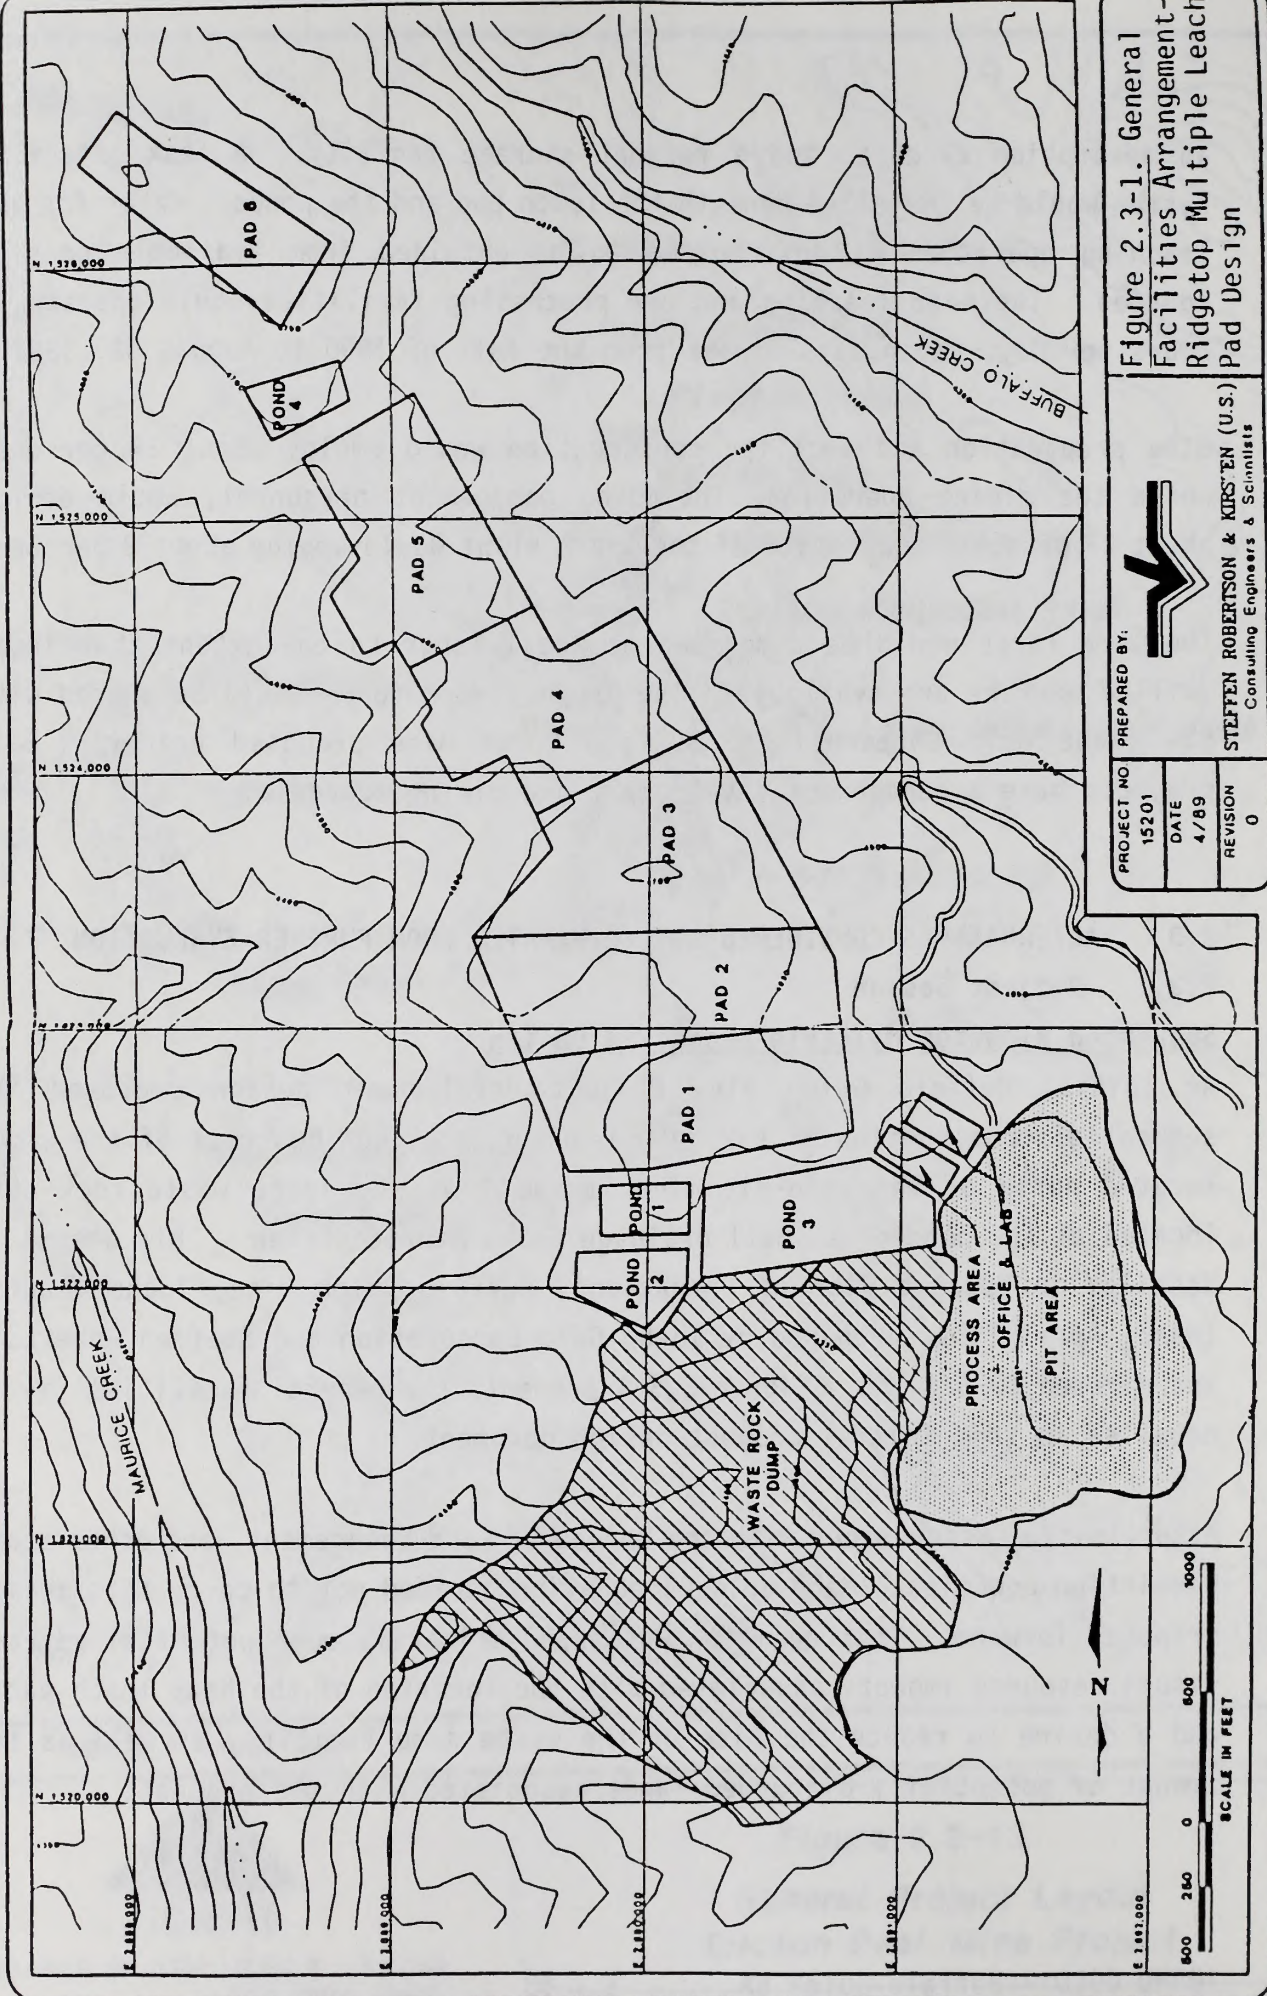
General Facilities Arrangement - Ridgetop Multiple Leach Pad Design
